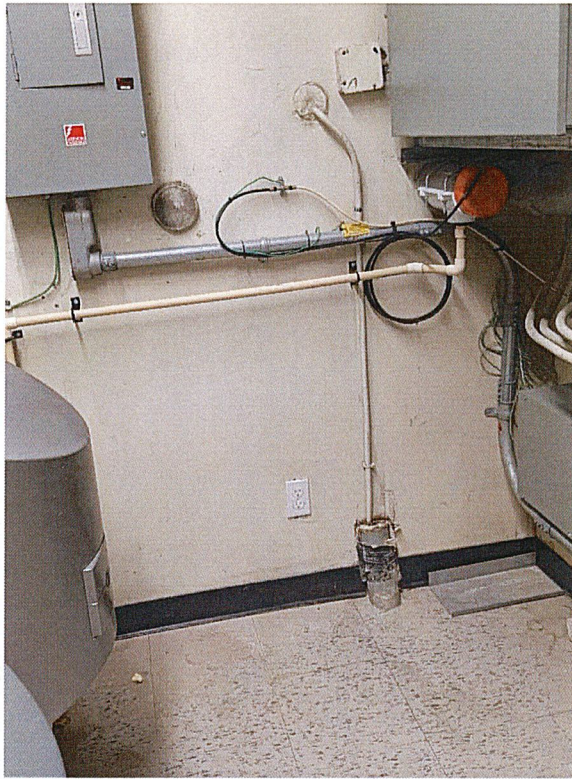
Hot Water Tank and Mixing Valve
